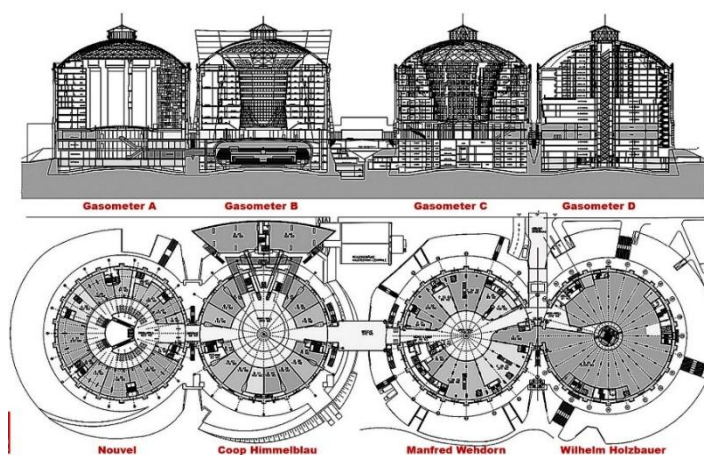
Austria. (n.d.). Section and plan diagram of Vienna Gasometers A–D
